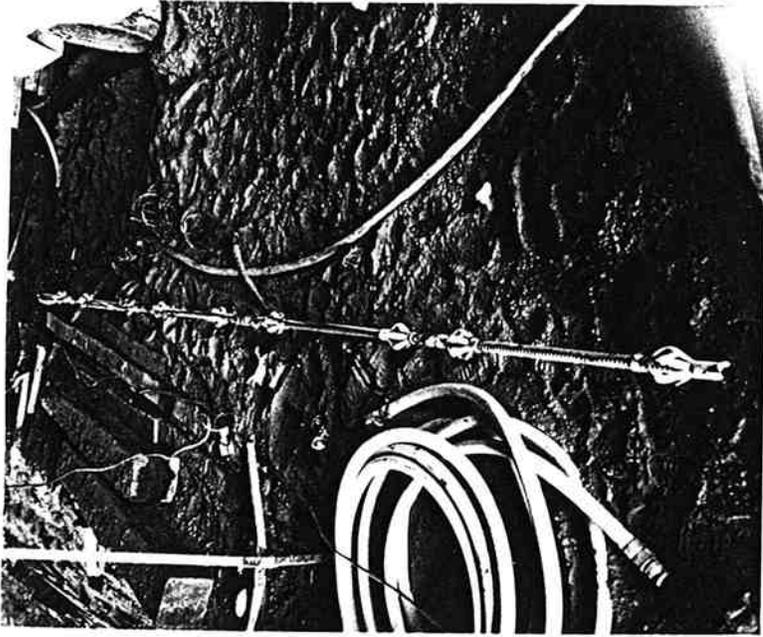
Instrumented nail with vibrating wire strain gauges
